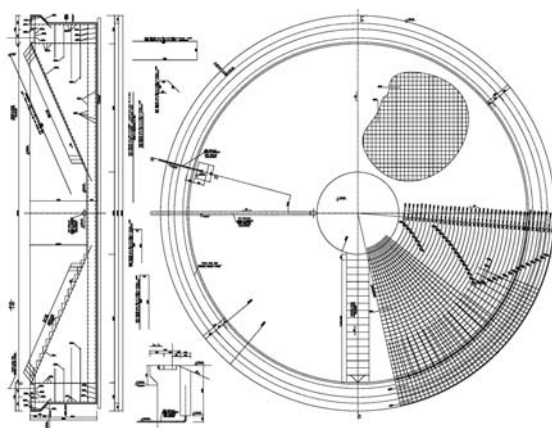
a) The plan, b) cross section of the circular foundation plate of the fermentational chamber
